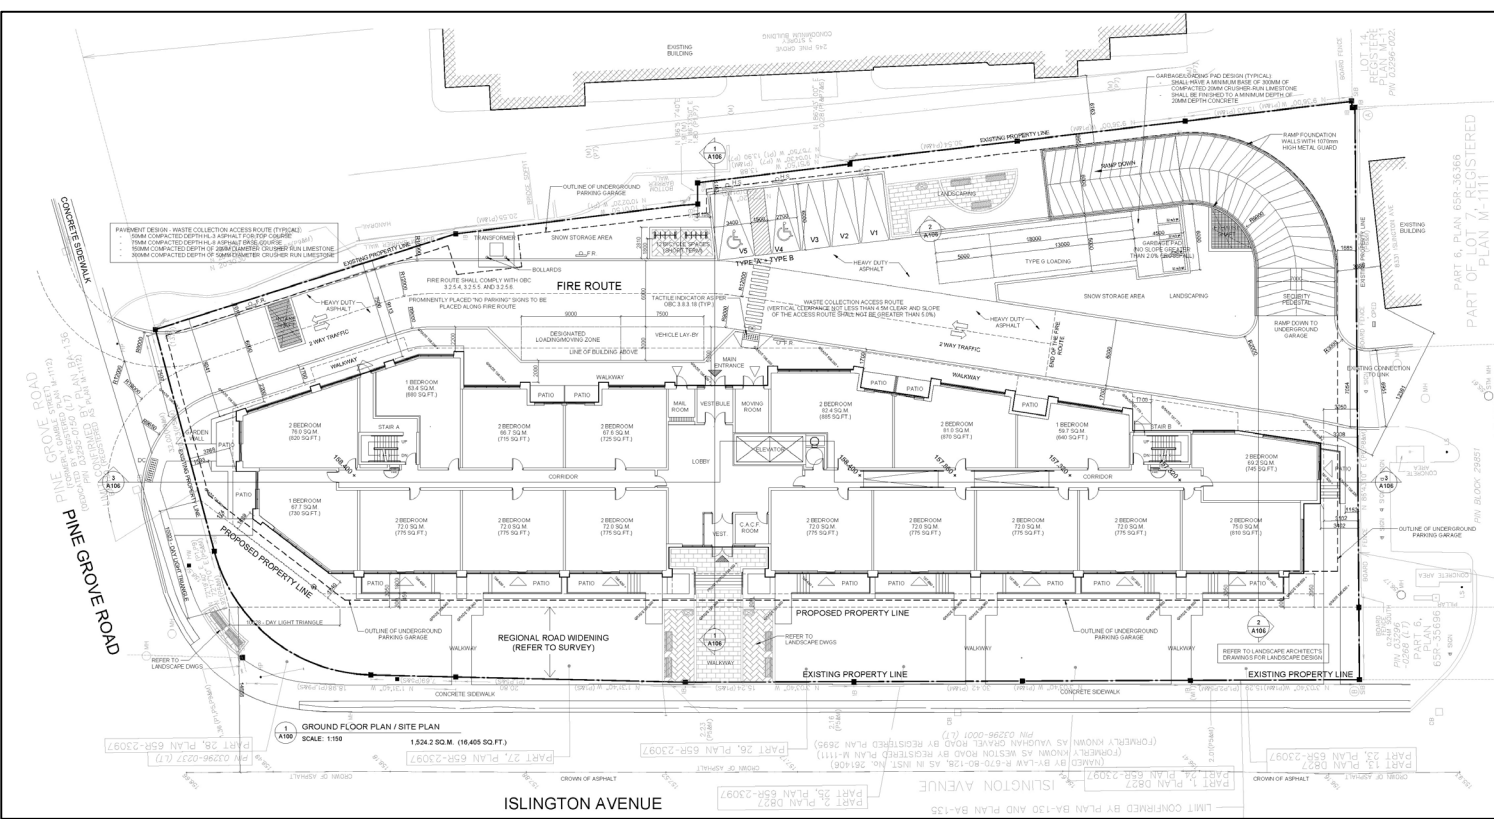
Site Plan / Ground Floor Plan (SRN Architects 2020)
